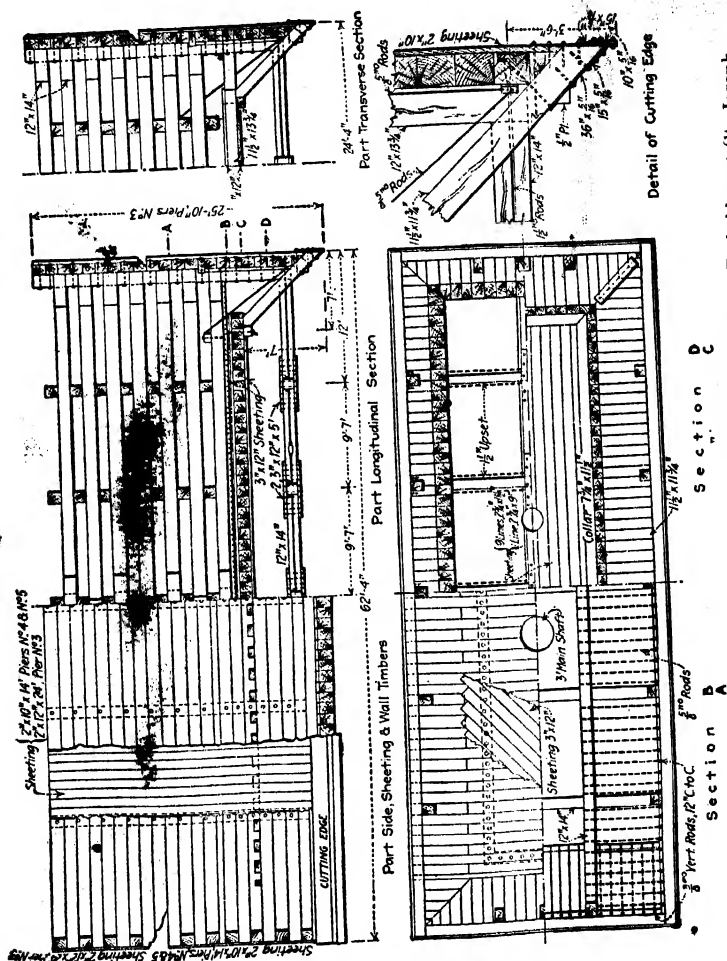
Details of pneumatic caisson for the Union Pacific R. R. bridge at St. Joseph.
